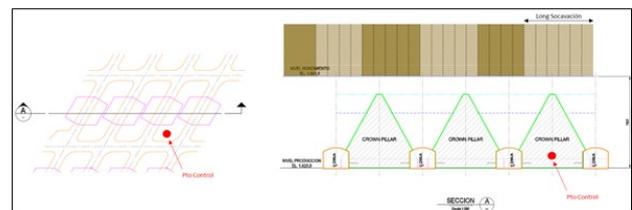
Plan View Pillar Over-Excavation, Macro block N1/S1, Chuquicamata Underground.
